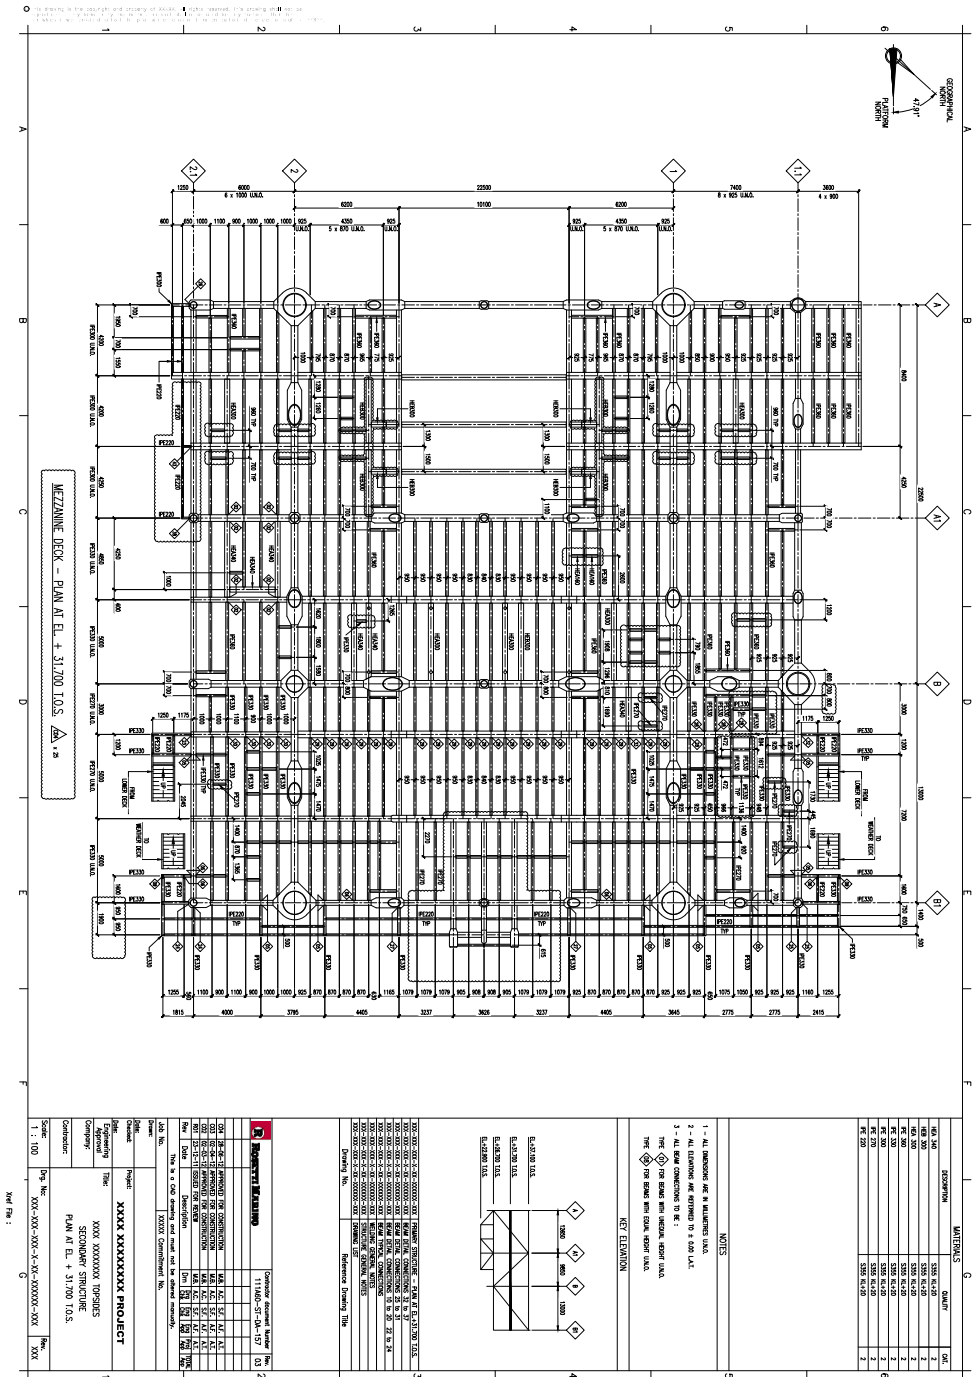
Mezzanine level deck - Plan view - Secondary structure
